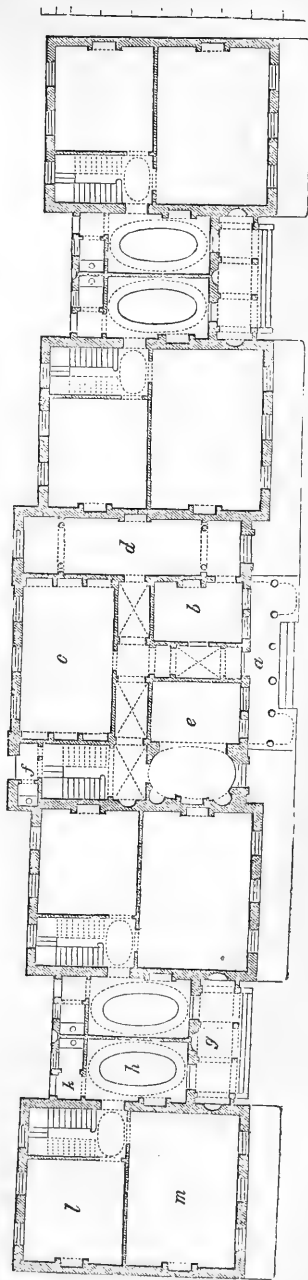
Enlarged Ground Plan of Five Suburban Dwellings.
